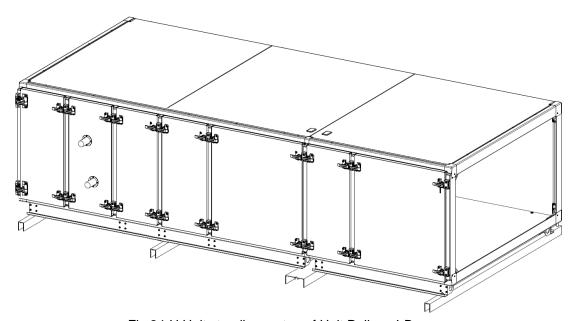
H Unit standing on top of Unit Rails or I-Beams
